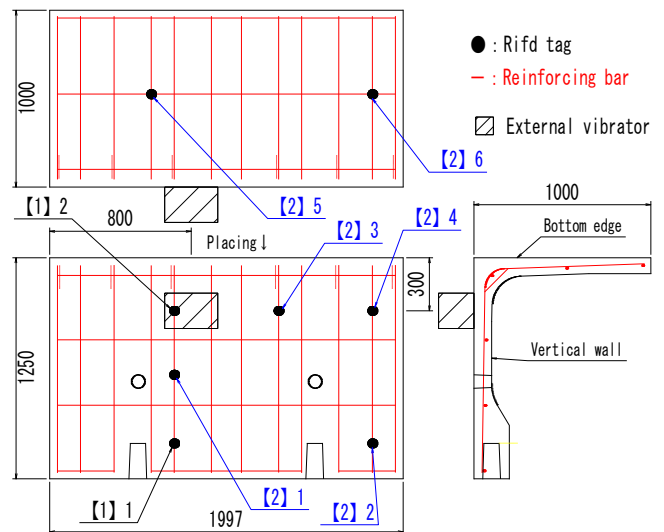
L-shape retaining wall (Rfid tag : [1] 1~2、[2] 1~6)
